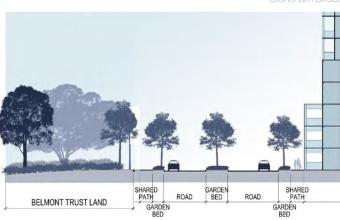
Resolution Drive and Stoneham Street (Plan Extract and Indicative Section)
